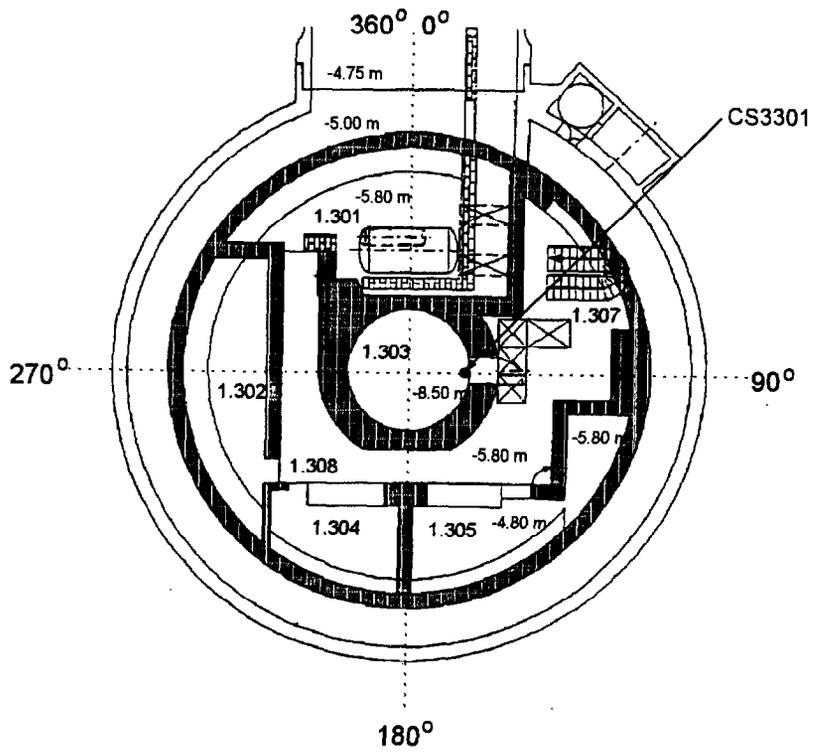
Level 1.200 and 1.300 at the -6.5 m Elevation for T51.19
